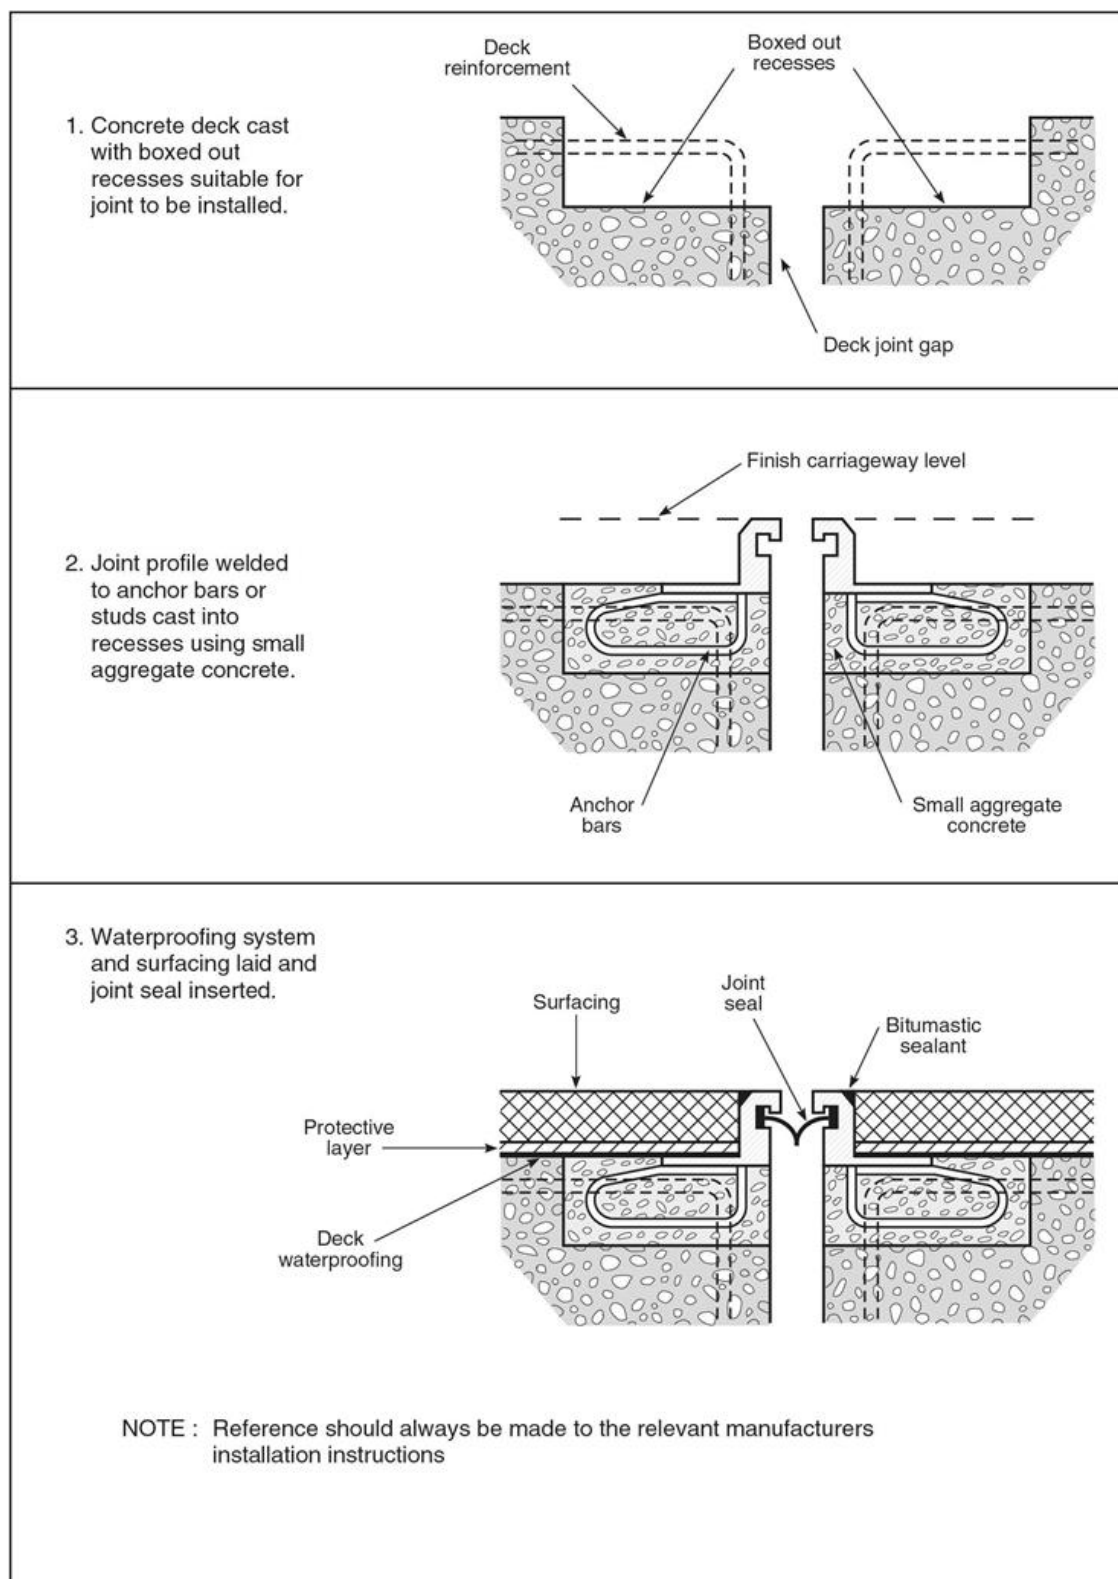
Typical installation procedure for joints fixed to deck using cast-in anchor bars or studs (single element modular joint shown) (Source Ref 1.1)
